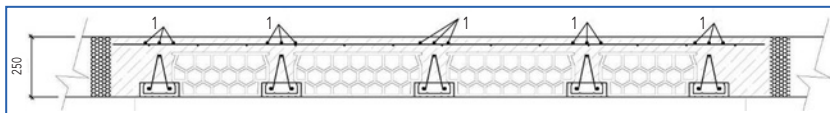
Cross-section of ceramic half-mounted floor [10]
